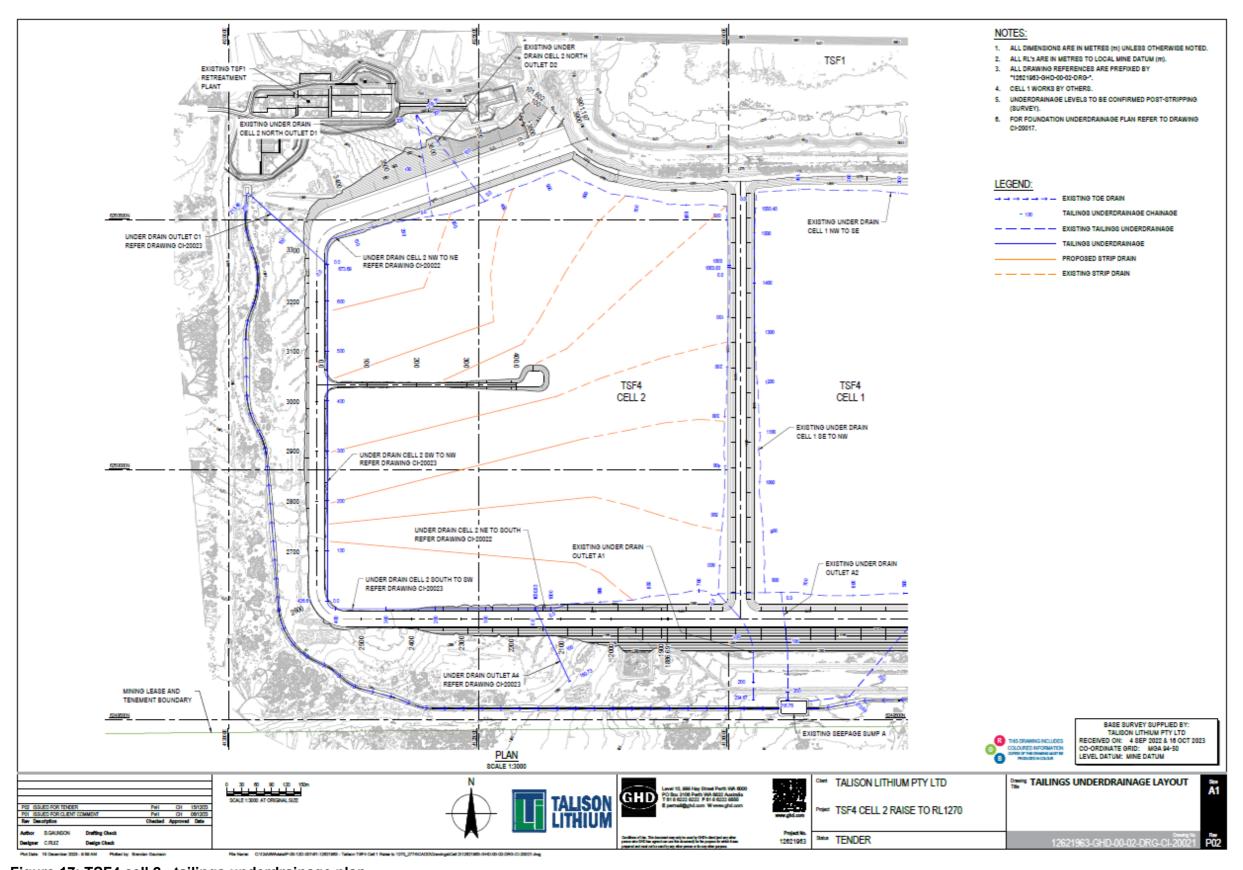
TSF4 cell 2 - tailings underdrainage plan
